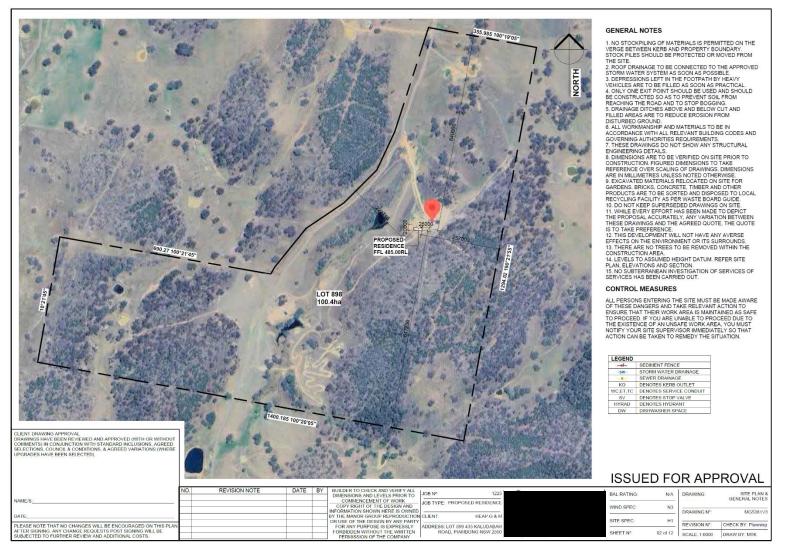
Site Plan showing dwelling location and setbacks to boundary.
